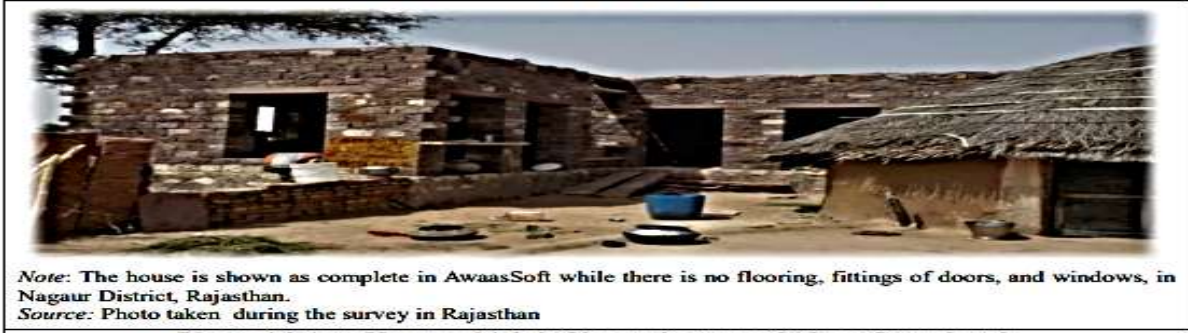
A House which is Shown in AwaasSoft as Completed.
